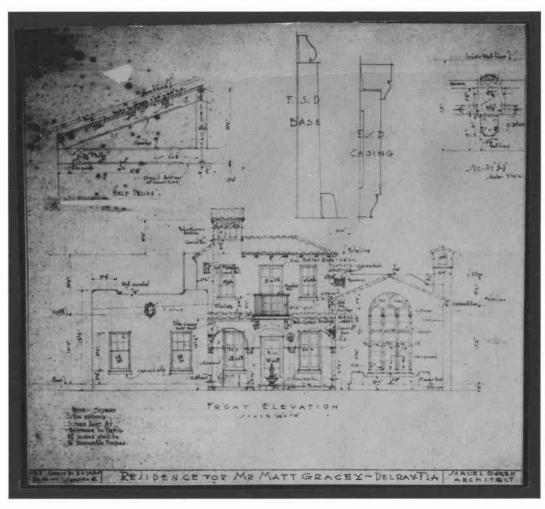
Front Elevation (East Facade) Matt Gracey House (#248) dated 7/7/1925 Sam Ogren, Architect Property of Frank McKinney
